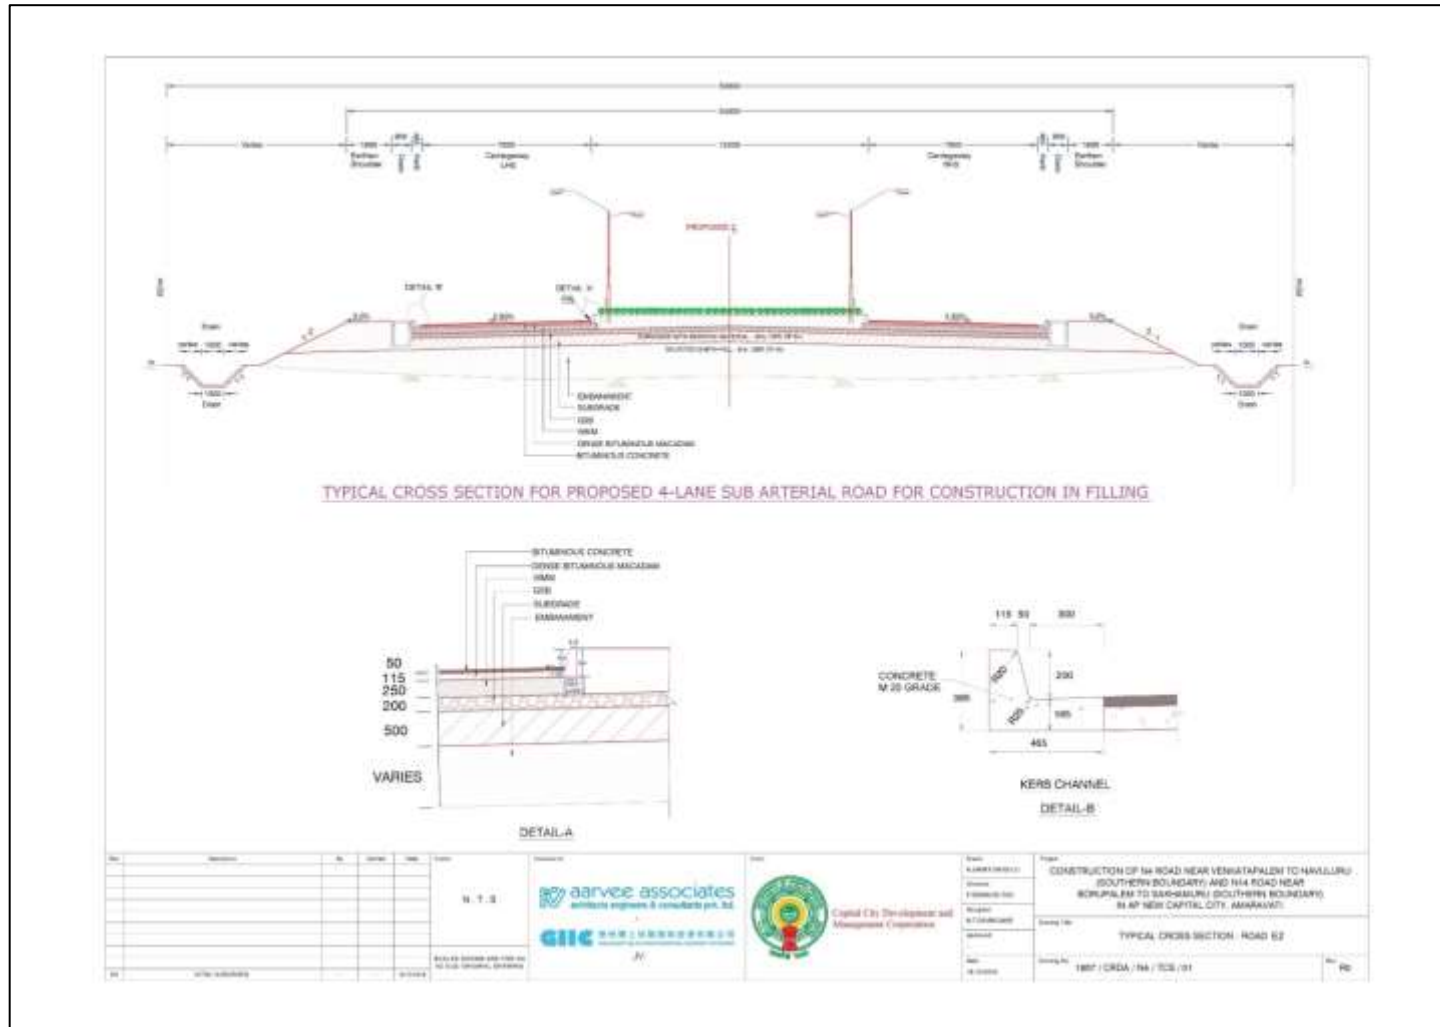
TCS for proposed 4-Lane Sub-arterial road for construction in Filling
